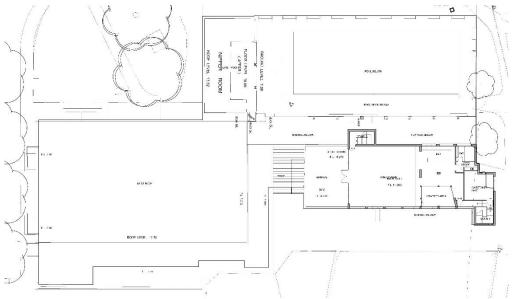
Second Floor Plan (extract of plans by Bergstrom Architects 2017
